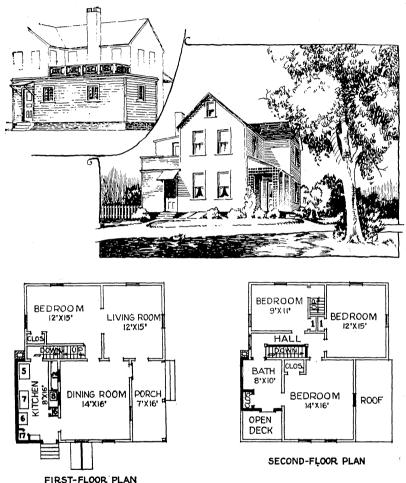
House 7 as remodeled by owner. Inset shows kitchen wing of alternate plan (fig. 35).
